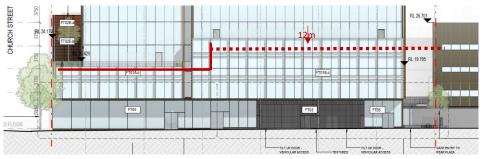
red dashed – preferred street wall height; solid line –proposed street wall height (Sanders Place)
